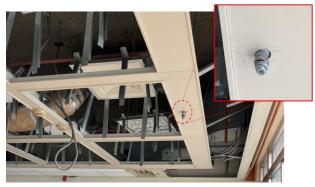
Failure of the sprinkler head due to interaction with the ceiling, Taitung Hospital (PGA: 535 gal).
